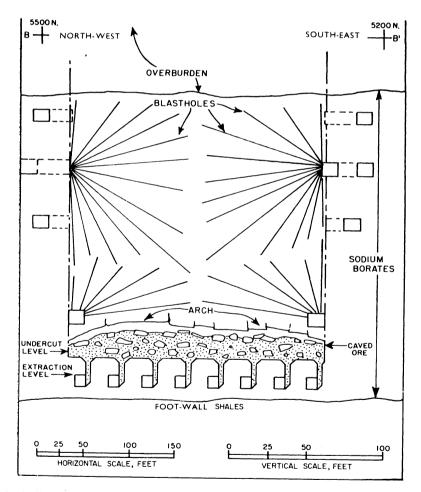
Idealized cross-section showing arch which developed after the support pillars had been removed leaving an undercut area 272 × 130 ft (35,000 ft²).
